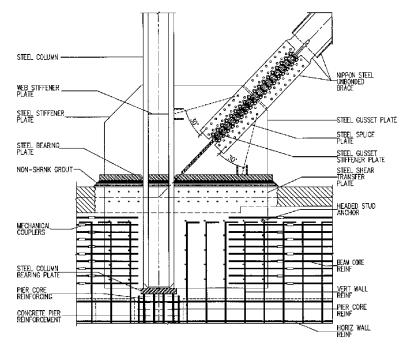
a. Brace connection detail at grid lines Q'-2'.
